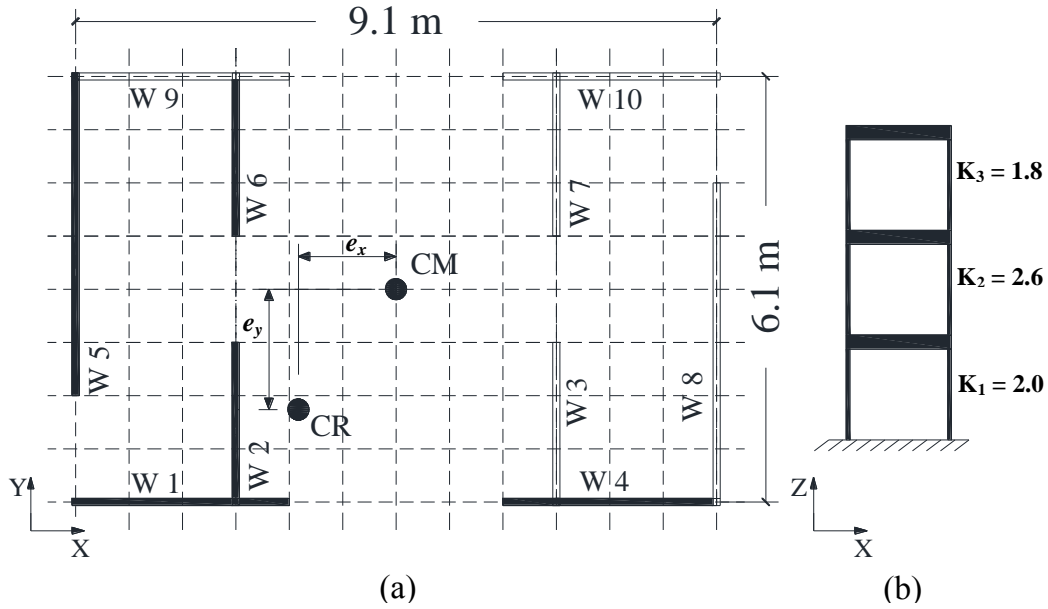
Building with excessive torsion: (a) plan view; (b) elevation view.
